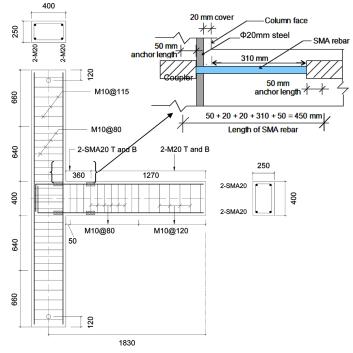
Reinforcement details of specimens JBC-2 and JBC-3 (dimensions in mm; 25.4 mm = 1 in)
